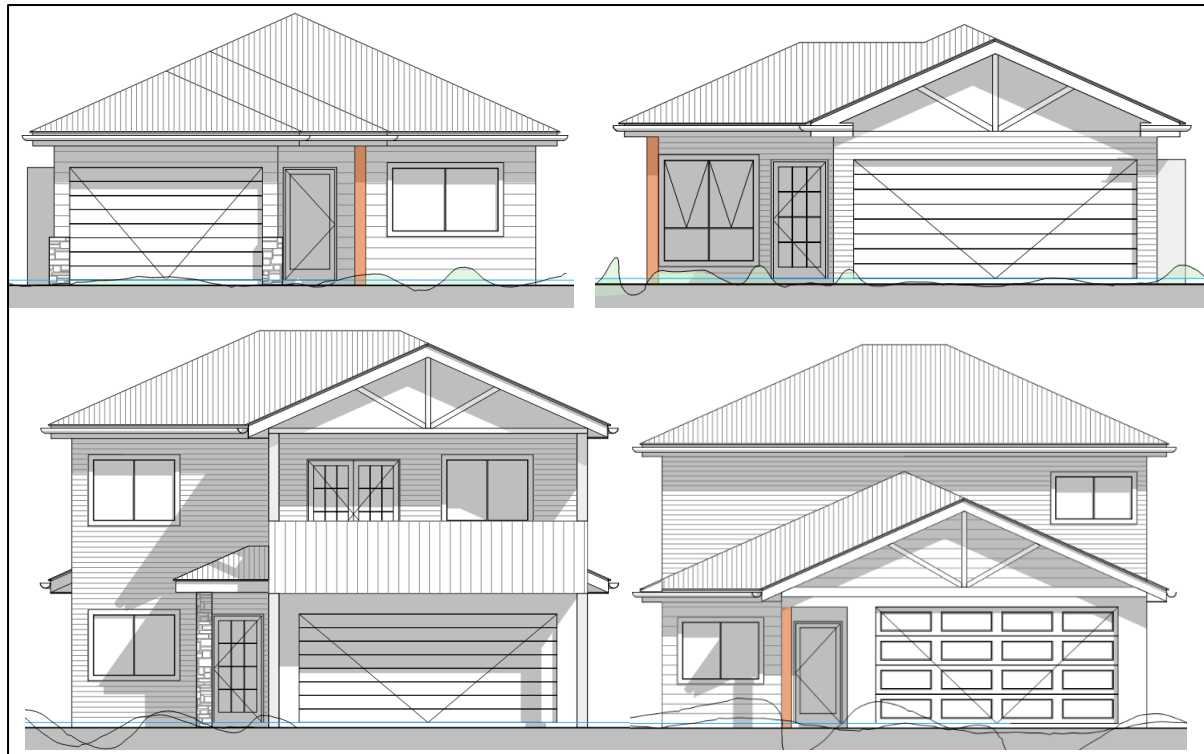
Preliminary Home Designs Street Elevations (Source: King + Campbell, 2025)
